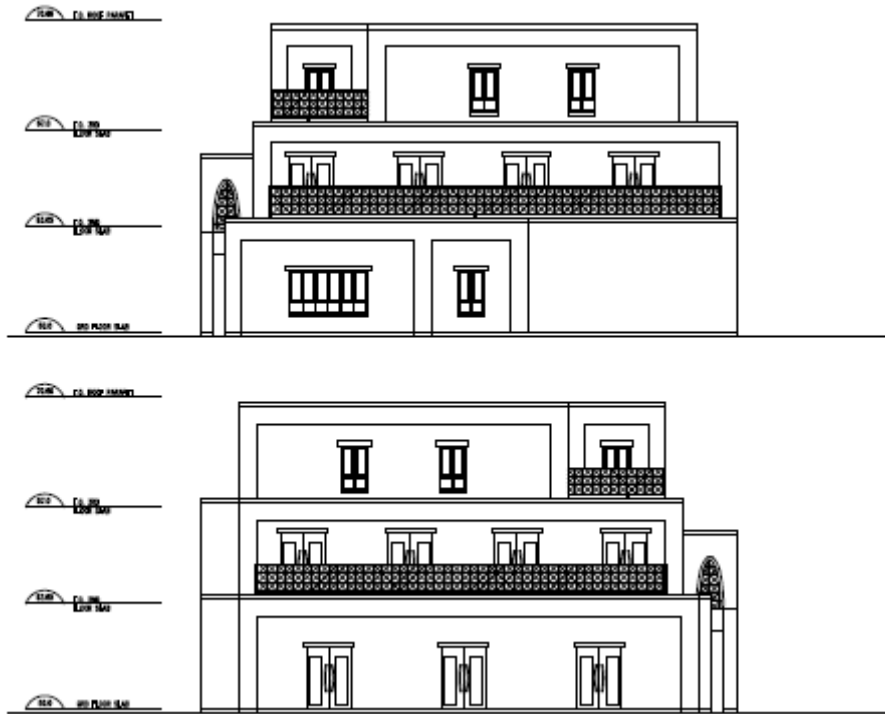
Conceptual plan (North and South elevations) for 187 Lansdowne Road. (Julian Jacobs Architects, 10 January 2012.)
